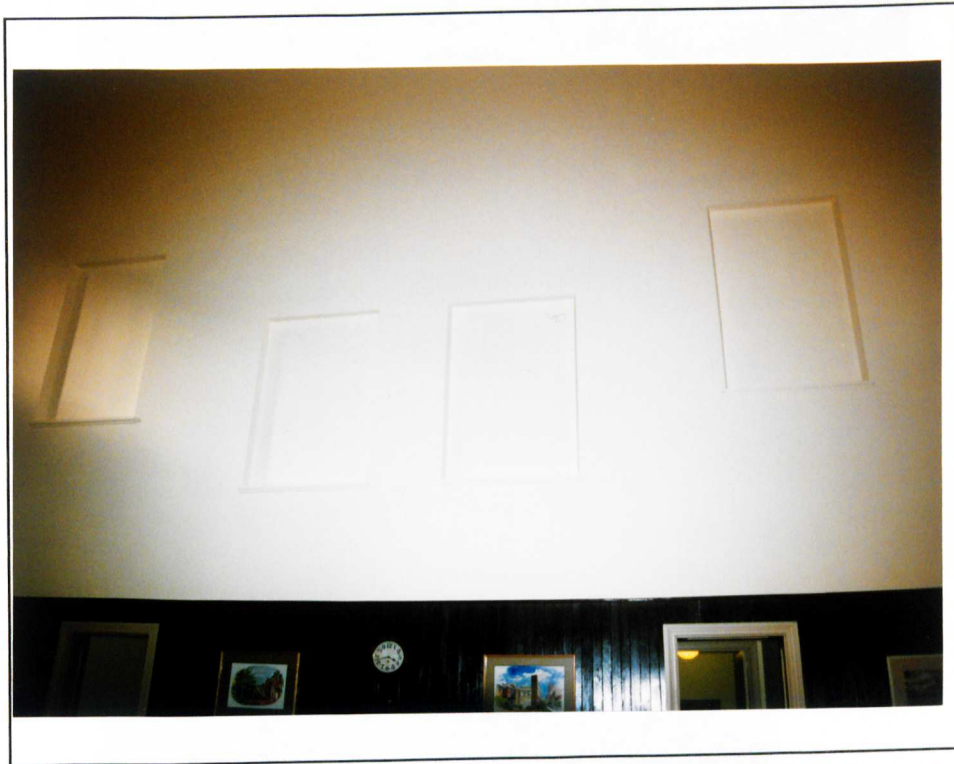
FILLED IN WINDOWS WHICH WOULD LOOK INTO THE NORTHERN MEETING ROOM (TAKEN FROM THE SOUTHERN MEETING ROOM)
